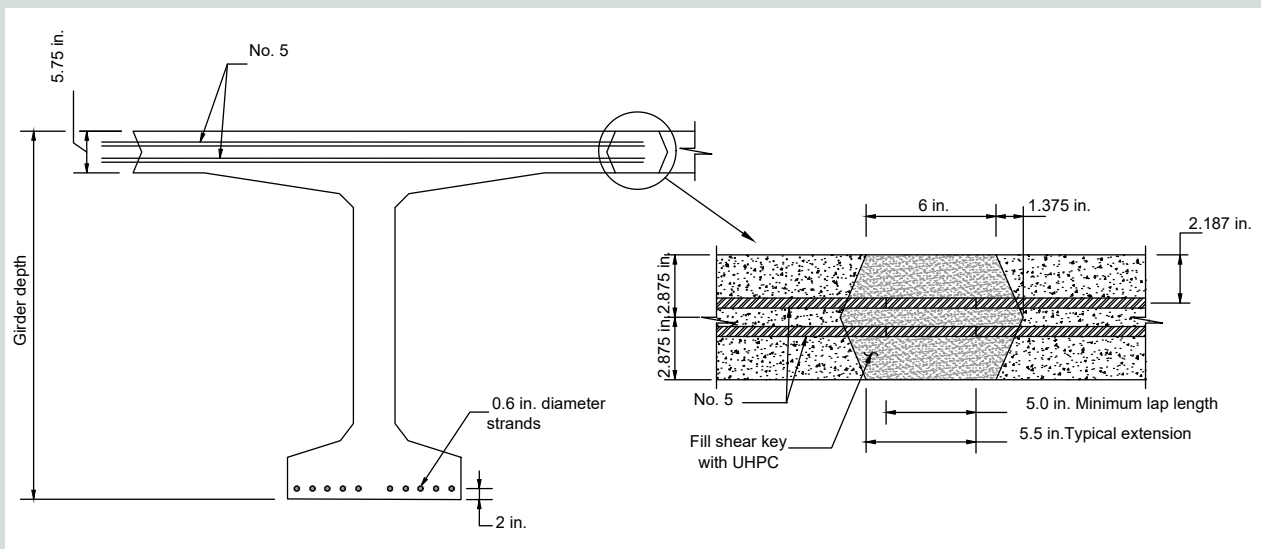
Girder longitudinal keyway detail. Note: H = girder depth; UHPC = ultra-high-performance concrete. No. 5 = 16M; 1 in. = 25.4 mm.
